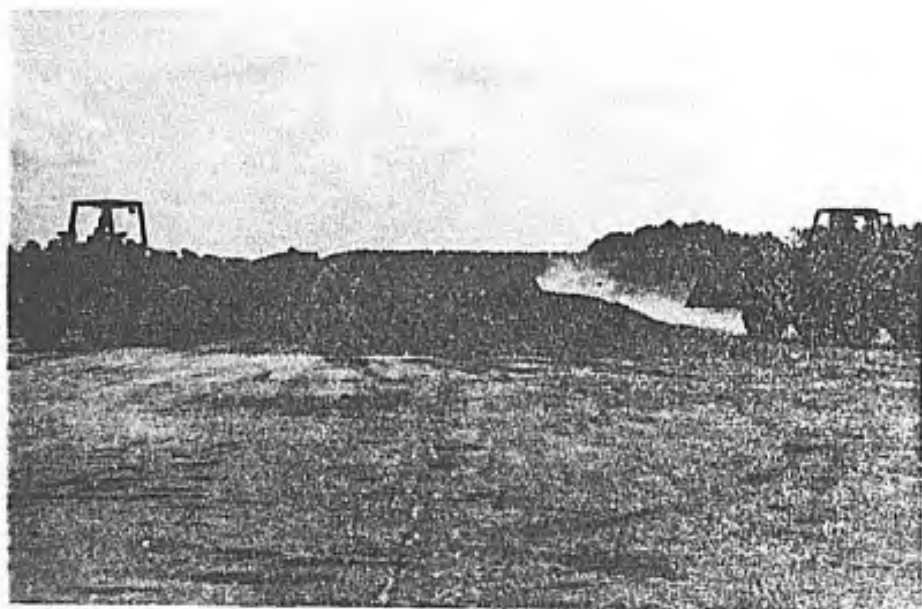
Piling of Blended PC and Silty Sand for Additional Mixing.
